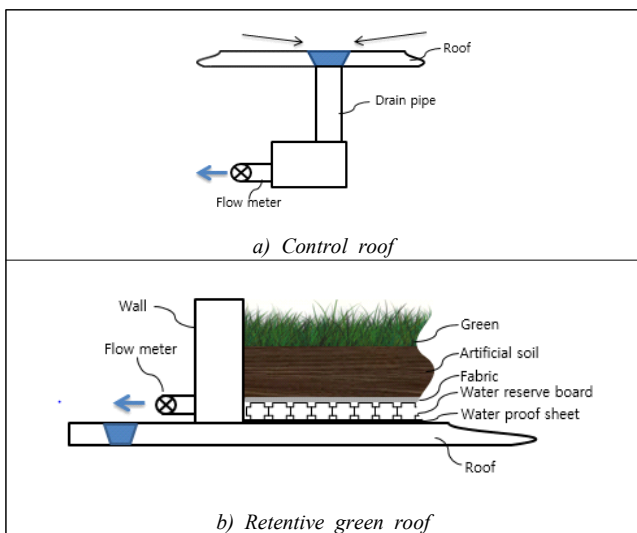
Cross section of Control roof(a) and Retentive green roof(b)
